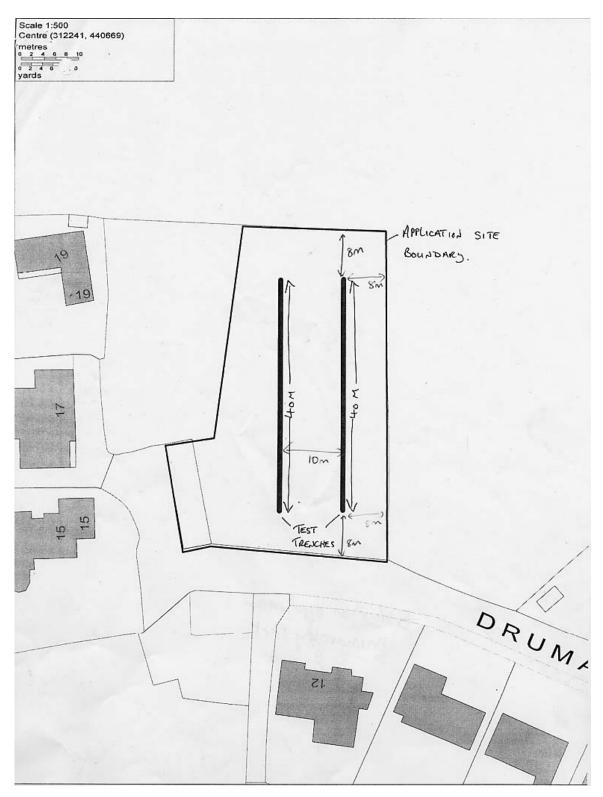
Plan of site showing test trench locations, as issued by PHM.
